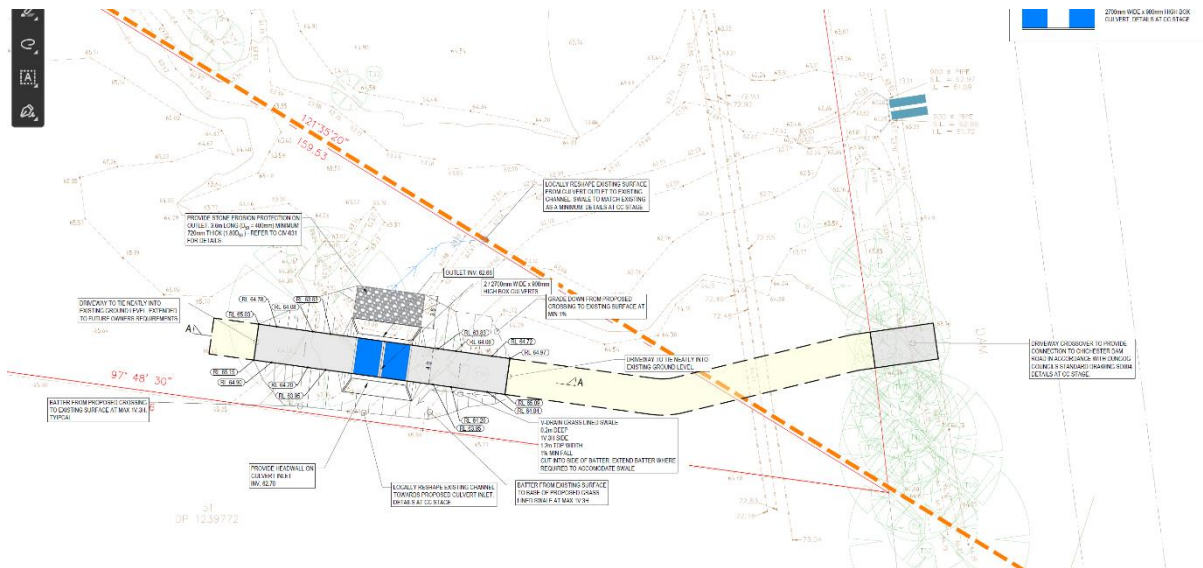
Civil Design Plans – Watercourse Crossing (Source: DRB Engineering, 2024)
